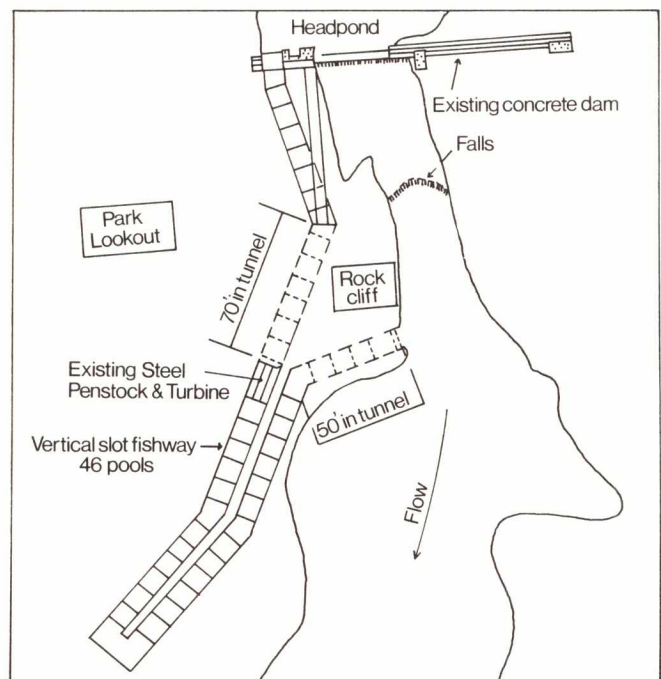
Site plan of proposed fishway for Tetagouche River, New Brunswick.
